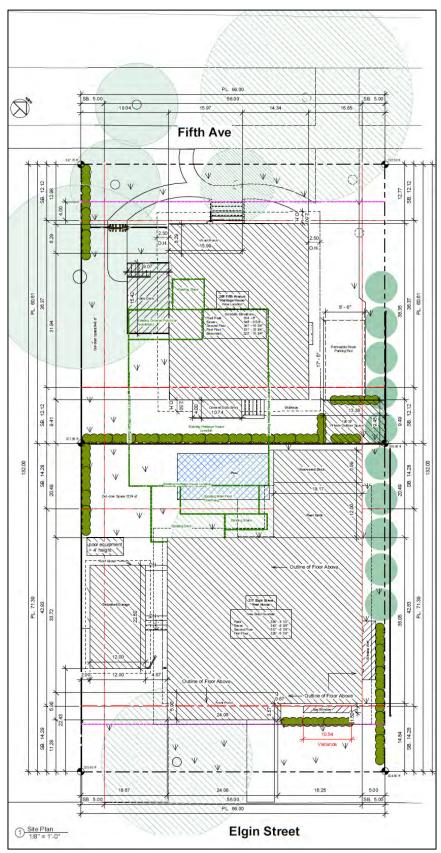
Site plan illustrating the proposed subdivision of 208 Fifth Avenue to facilitate a new build construction at the back of the lot, front Elgin Street. (Source: D3 Dimension, Drafting and Design Inc.)
